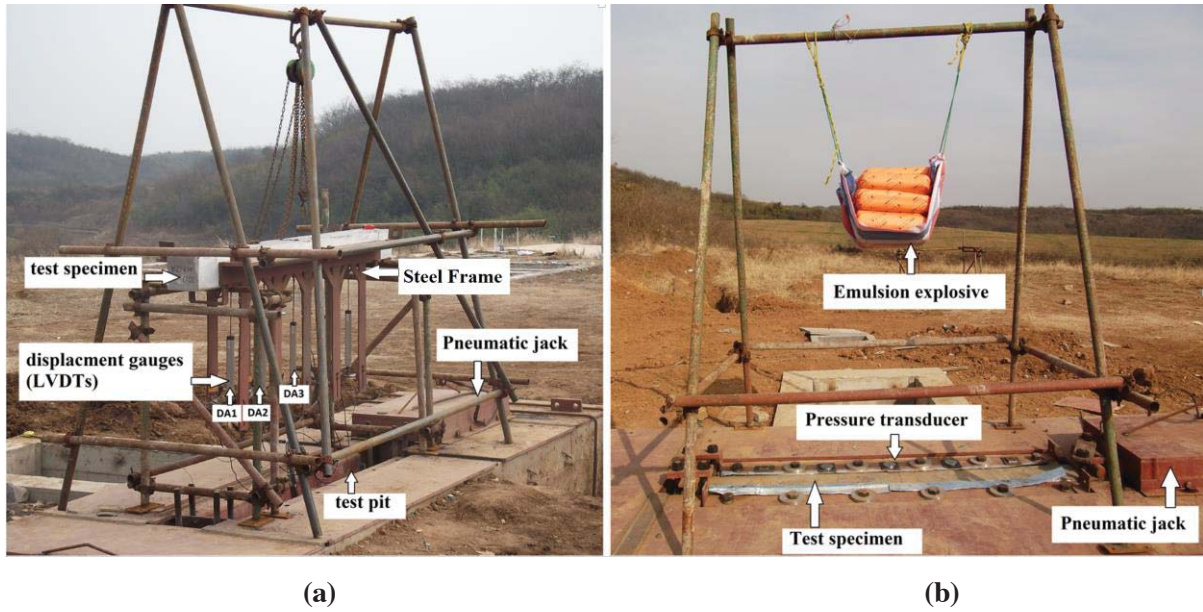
Blast test setup a) before, b) after the specimen being installed into the test pit
